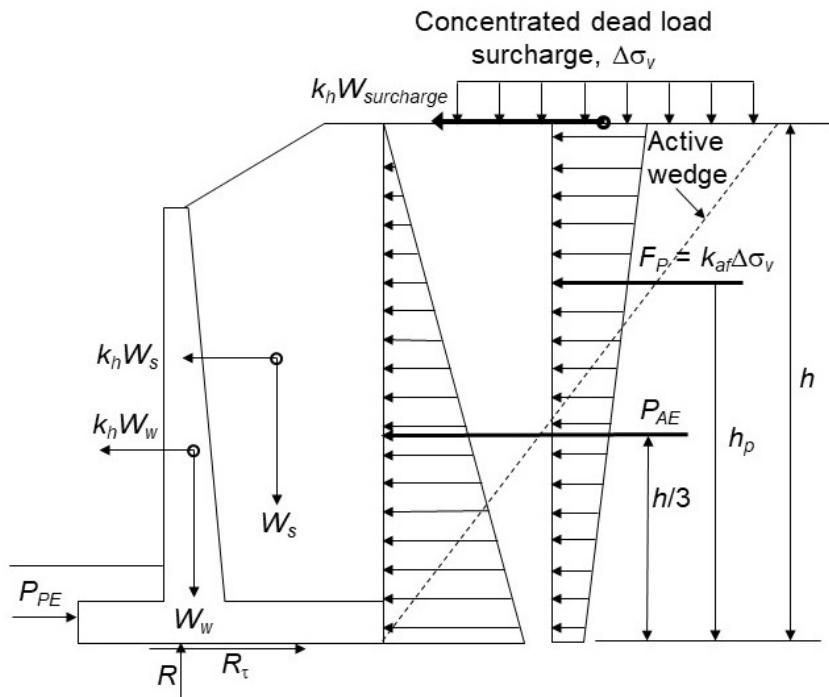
Seismic Force Diagram for Gravity Wall External Stability Evaluation
